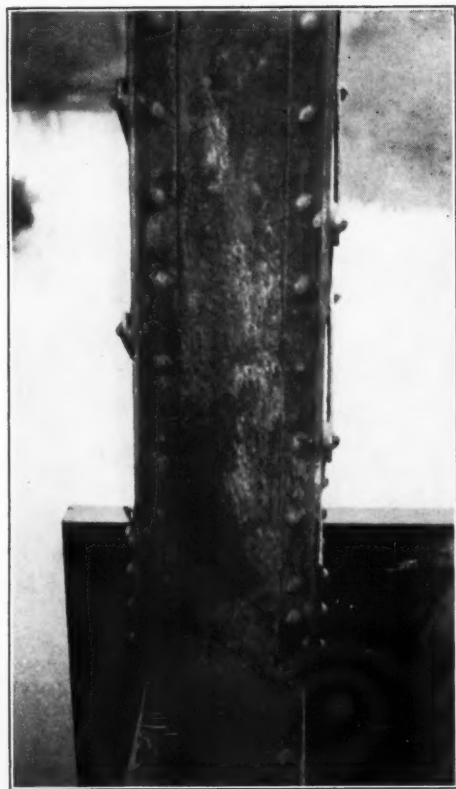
Showing a steel girder. A typical example of rusting of exposed surfaces.
